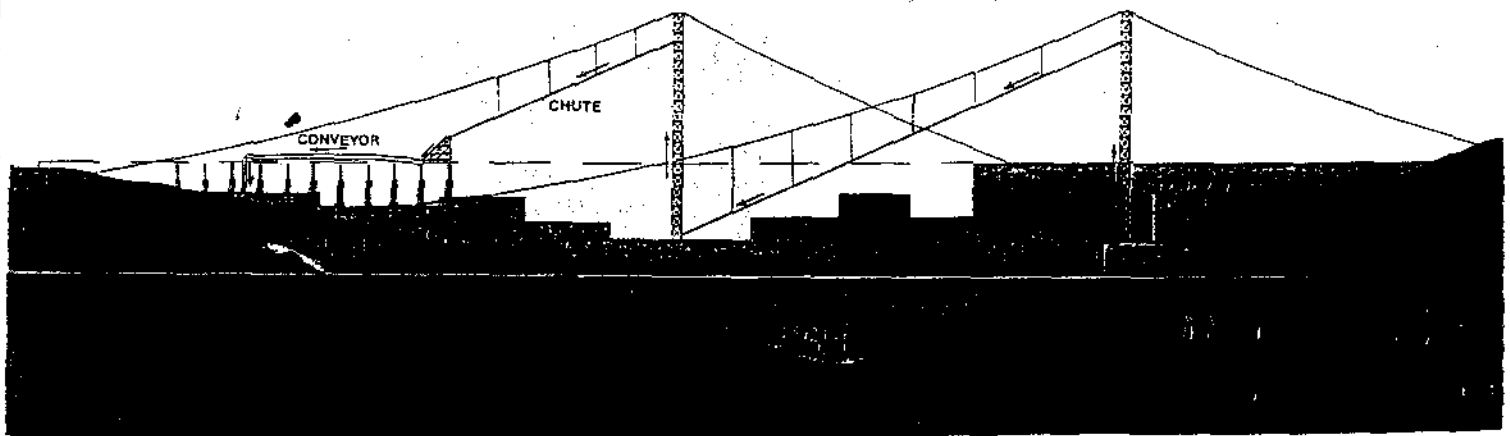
Stages of construction of dam monoliths showing towers and chuting system.
